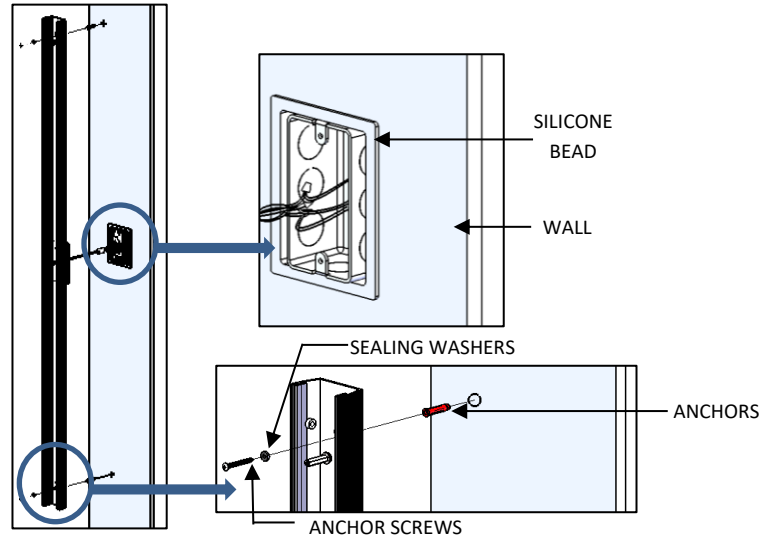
BACK-CHANNEL ASSEMBLY TO J-BOX
